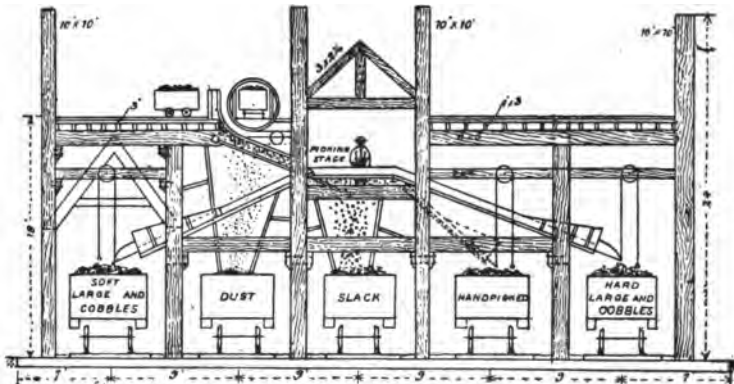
Elevation and section of screens shown in plan, Fig. 573.
